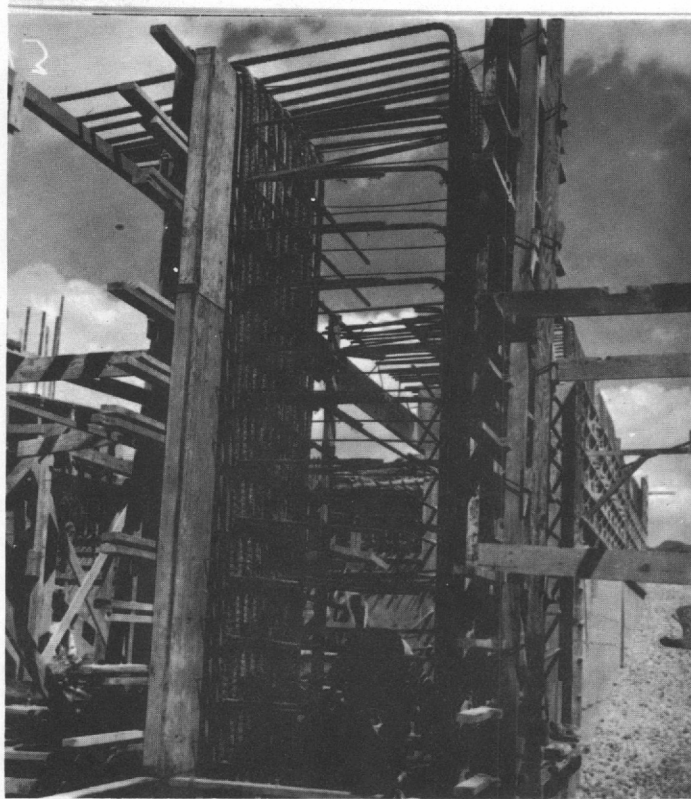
Partial reinforcement and formwork for east door pilaster.
